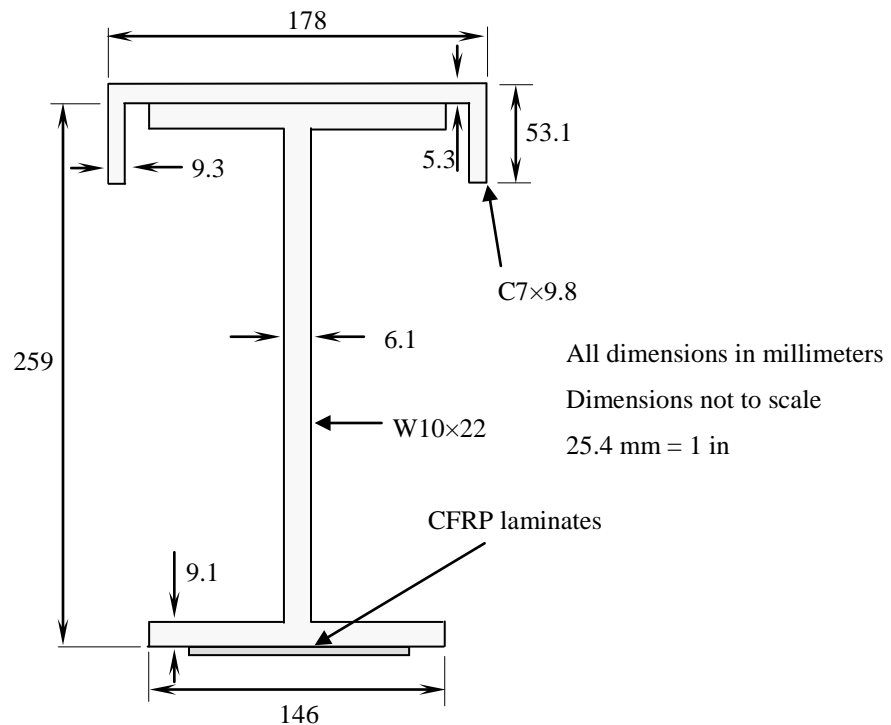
Dimensions of W10×22 and C7×9.8 composite section
